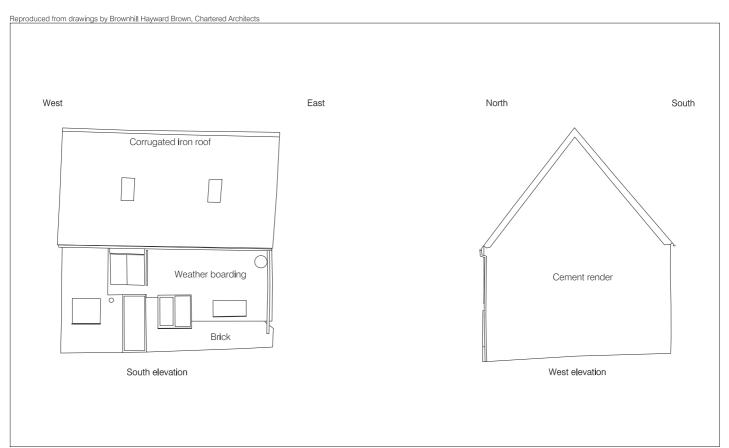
South and west elevations of Cottage (Building 4) Musgrove Maltings, Baldock Not to scale at A4
